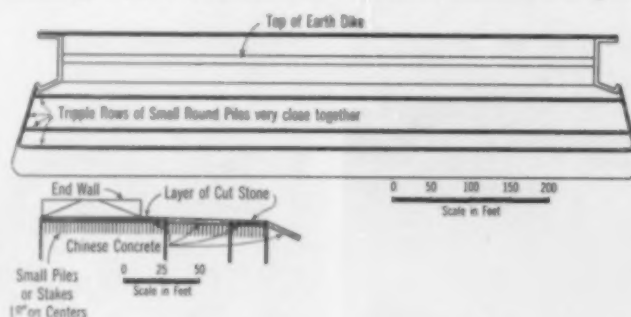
PLAN AND CROSS-SECTION OF THE CHA LOO FLOOD-RELIEF SPILLWAY ON THE GRAND CANAL
